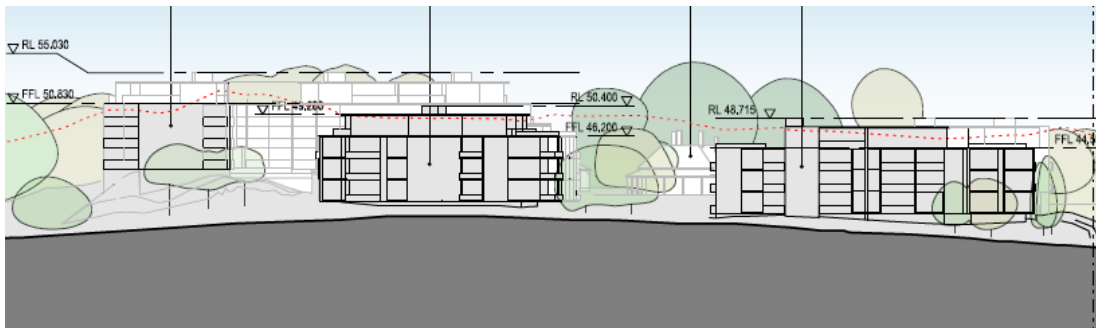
Approved elevation (Fisher Road frontage) (DA2011/1274)
